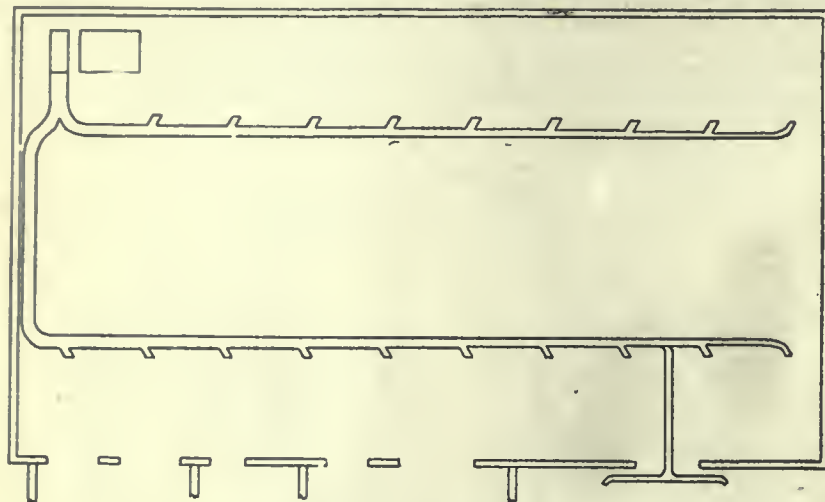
PLAN ARRANGEMENT OF MACHINE SHOP HEATING SYSTEM.
